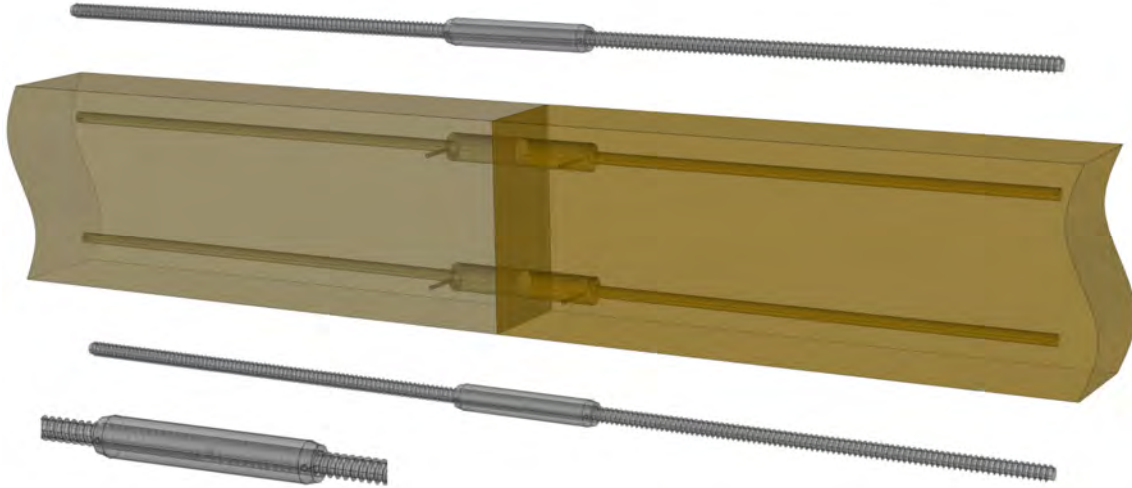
Schematic layout of splice connection with long threaded rods and grout-filled couplers
